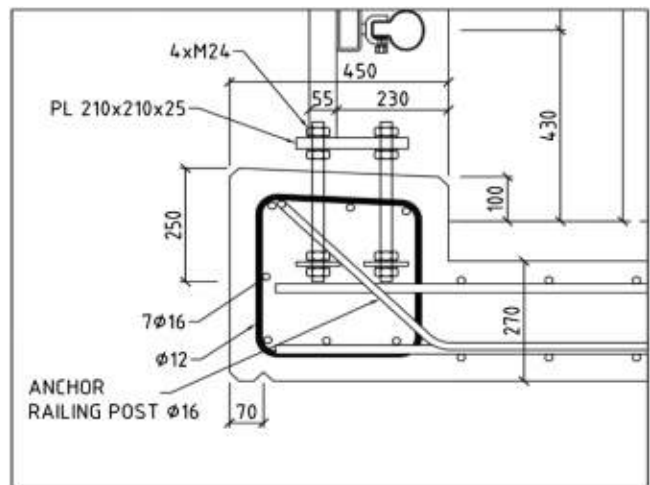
Design proposal with stainless steel in the stirrups (transversal reinforcement) marked in black.
